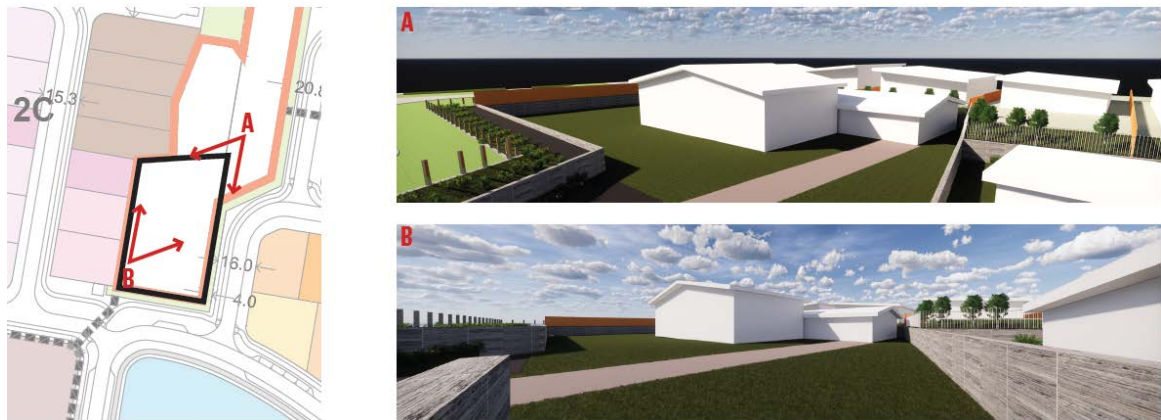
Plan showing perspectives from 12 De Vere Road from the west
